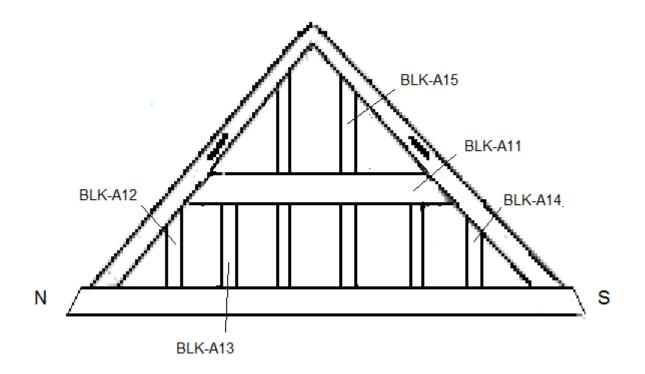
Sketch of truss 6, showing the location of samples BLK-A12–15
